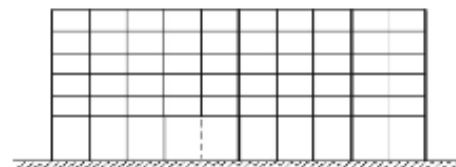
Strengthening the ground floor with more columns (but, this would have conflicted with architectural requirements)
